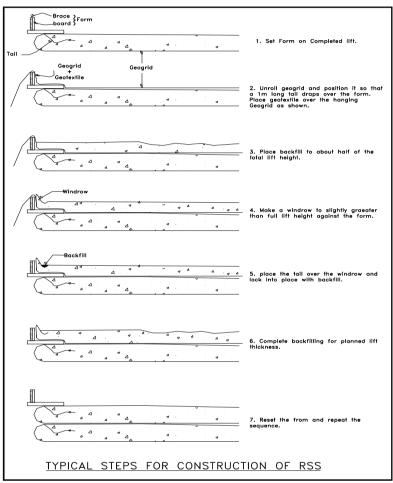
TYPICAL STEPS FOR CONSTRUCTION
